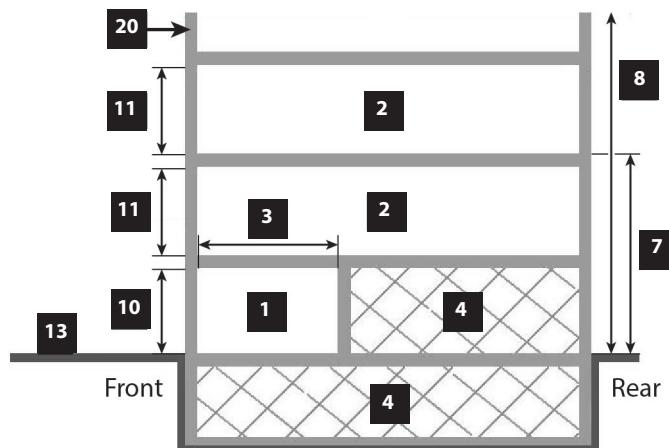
Limited bay building height and use diagram shown with basement and rear building interior parking, storefront entry type, and parapet roof type. Not to scale.
